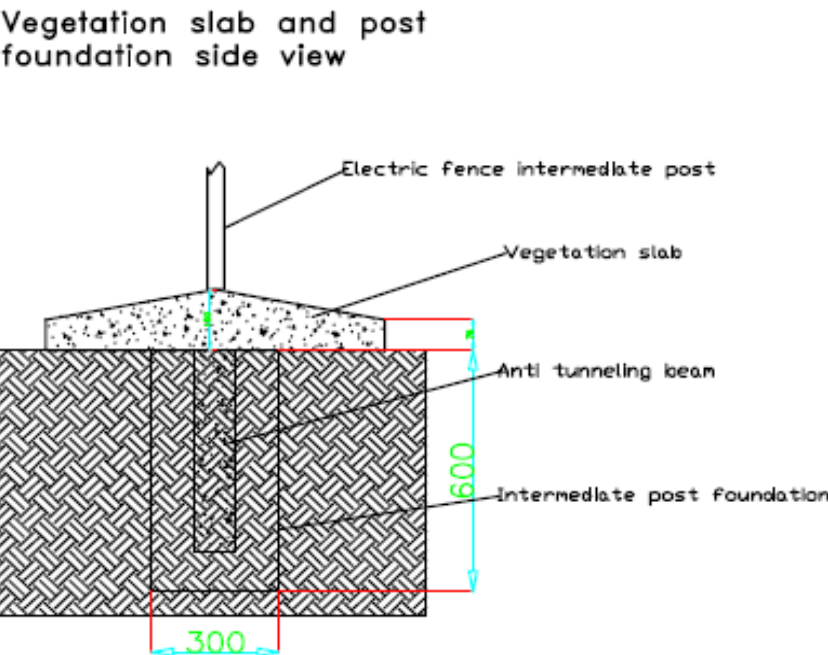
Vegetation Slab and Anti-tunnelling Beam Elevation Detail
